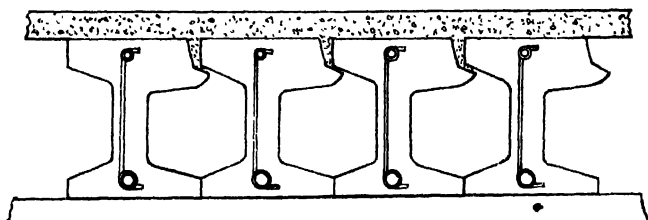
TYPICAL “ RAPID ” FLOOR CONSTRUCTION
